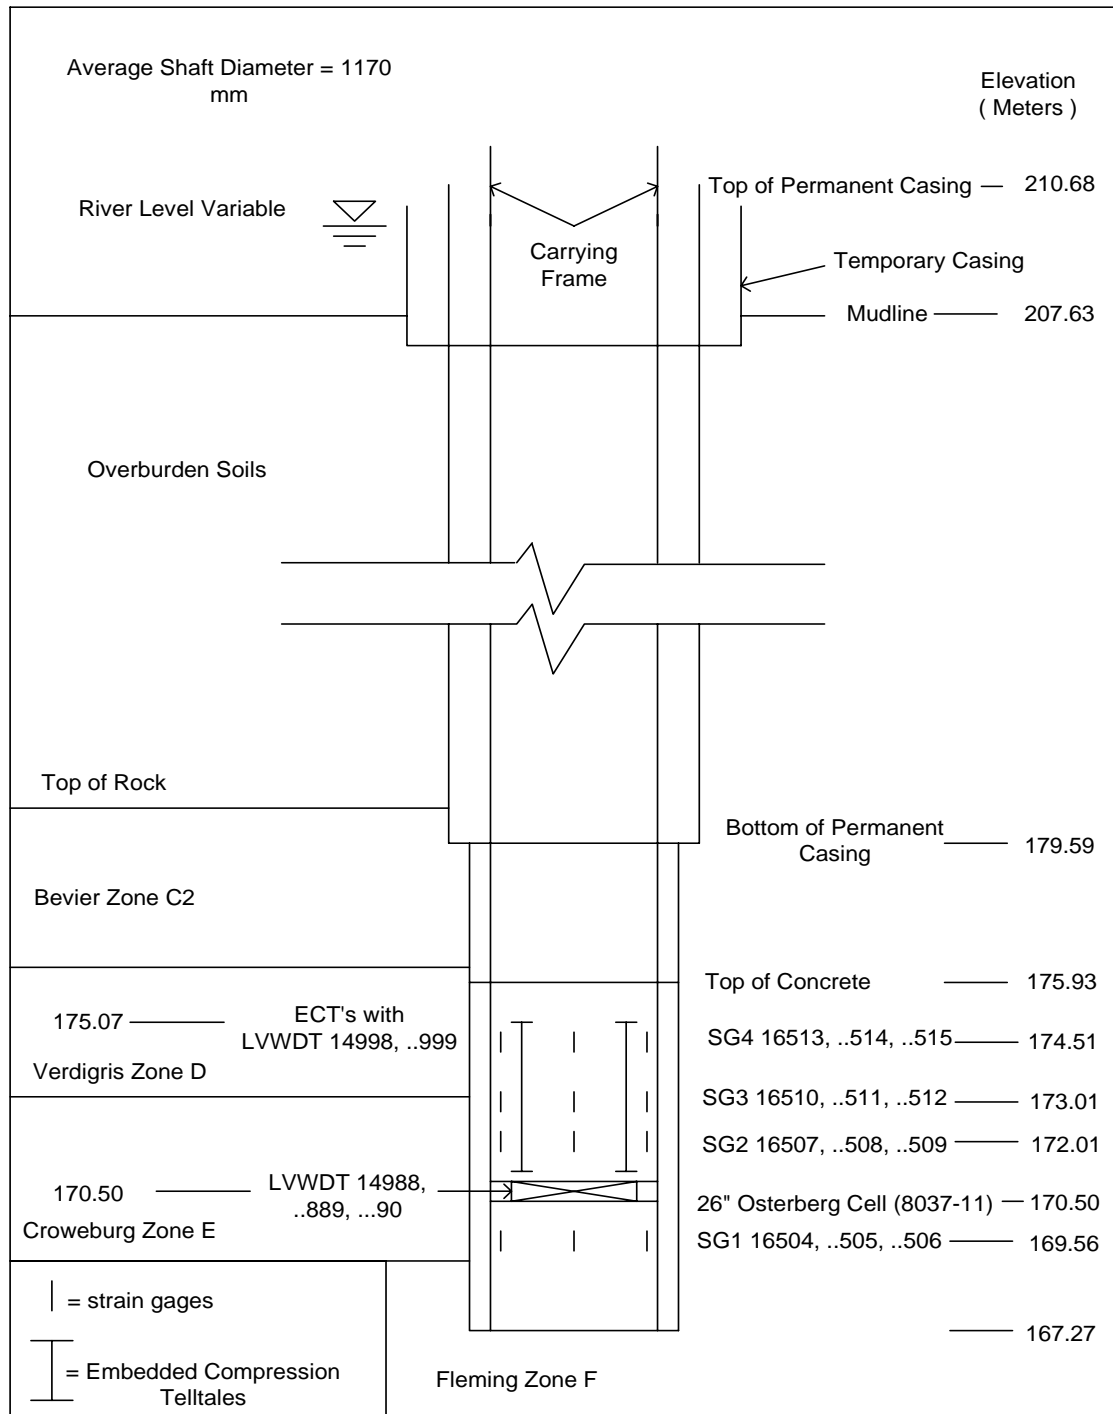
Schematic of test shaft TS-1A showing location of instrumentation.
